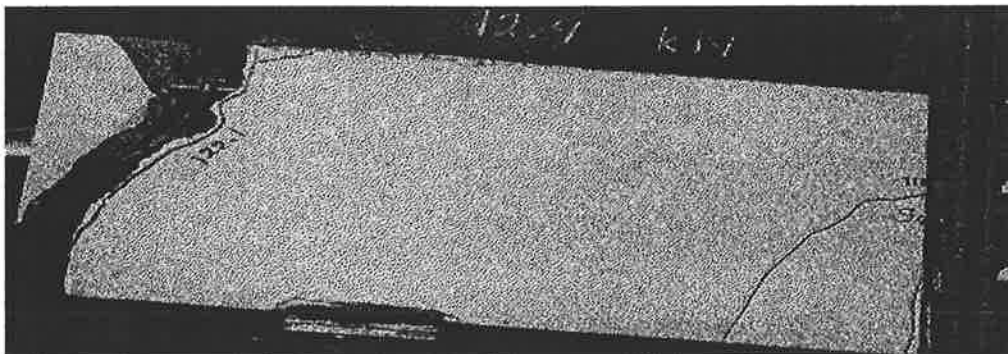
Crack due to debonding of rebar at the top.
